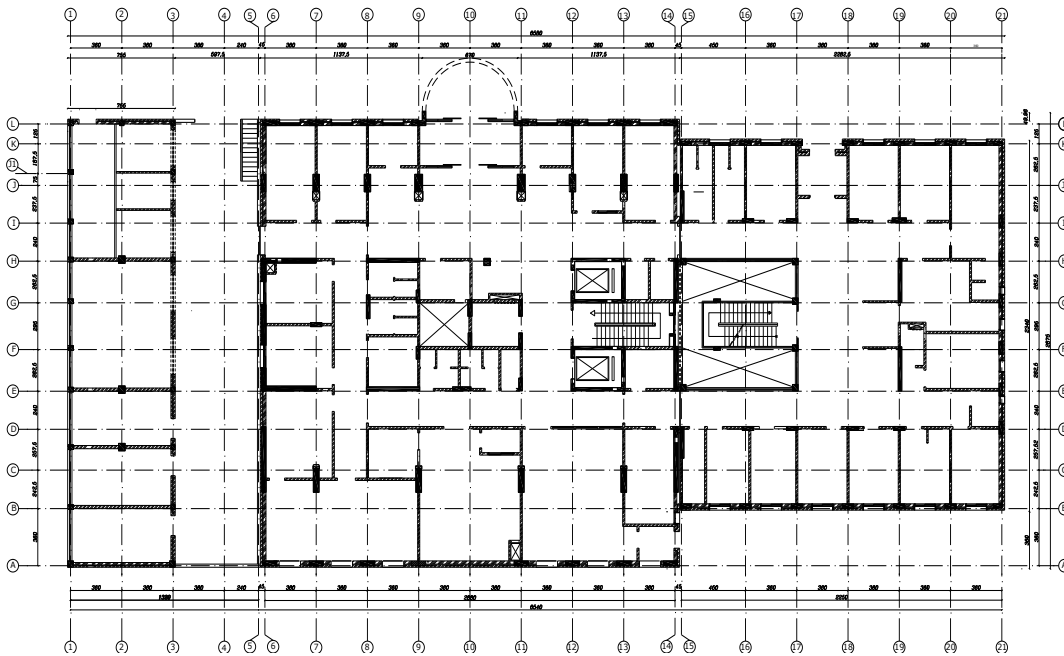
Ground stories plane, some non-structural elements were deleted for clarity.
